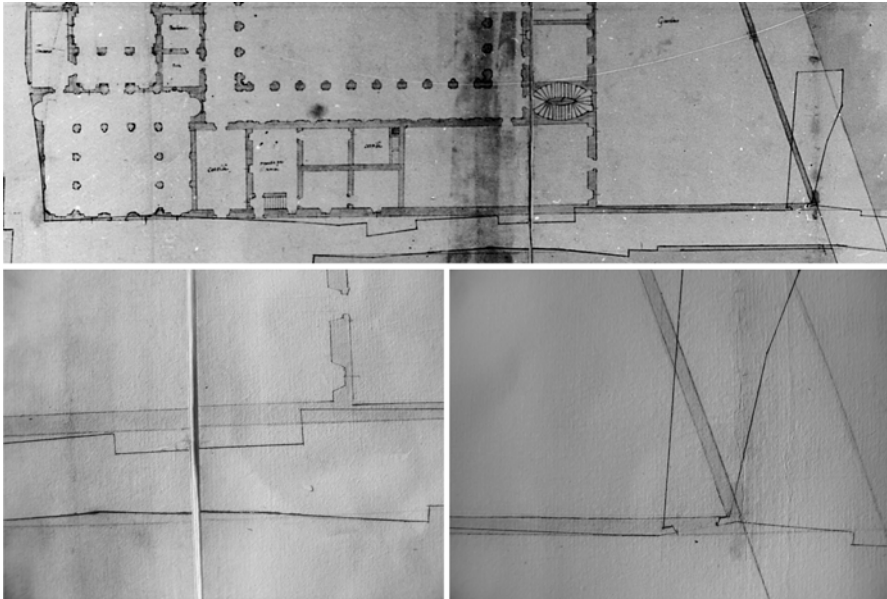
(a–c) Details from UA 4180, showing the existing building lines and the proposed street front of the new project
